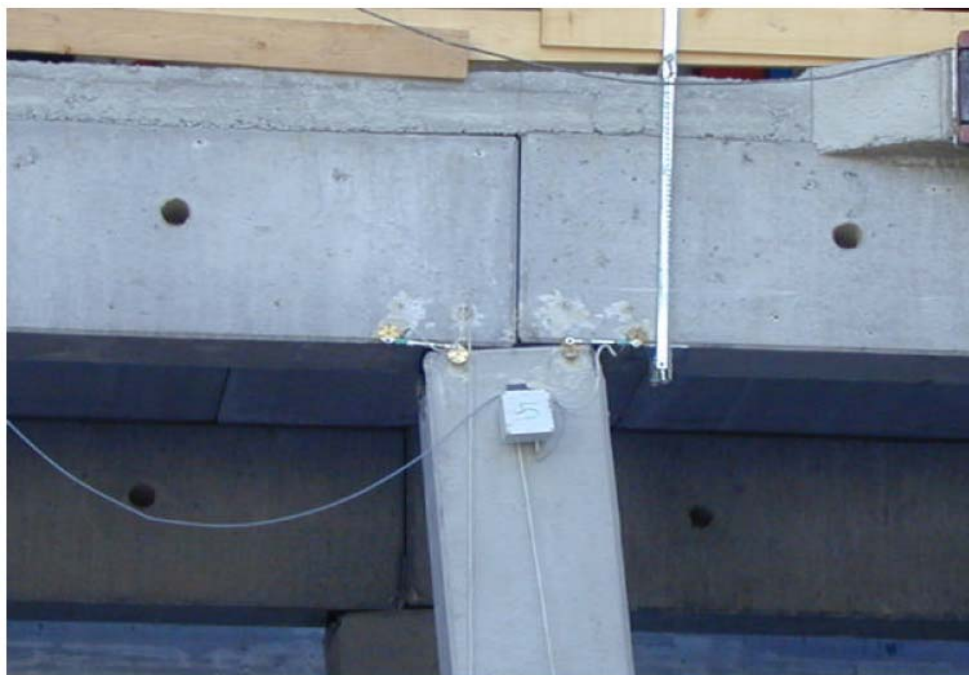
The beam-column joint of the precast building, Ferrera and Negro (2004)
